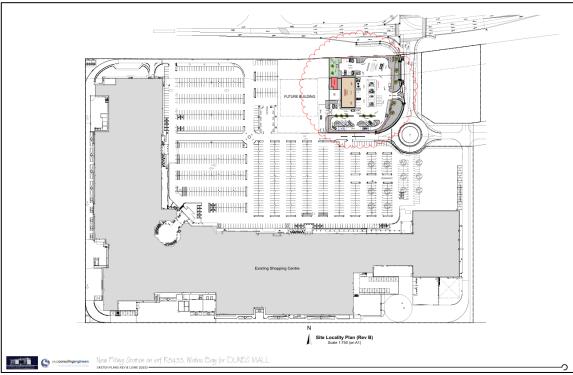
Proposed Site Plan (Conrad Scheffer Architects, 2025)
